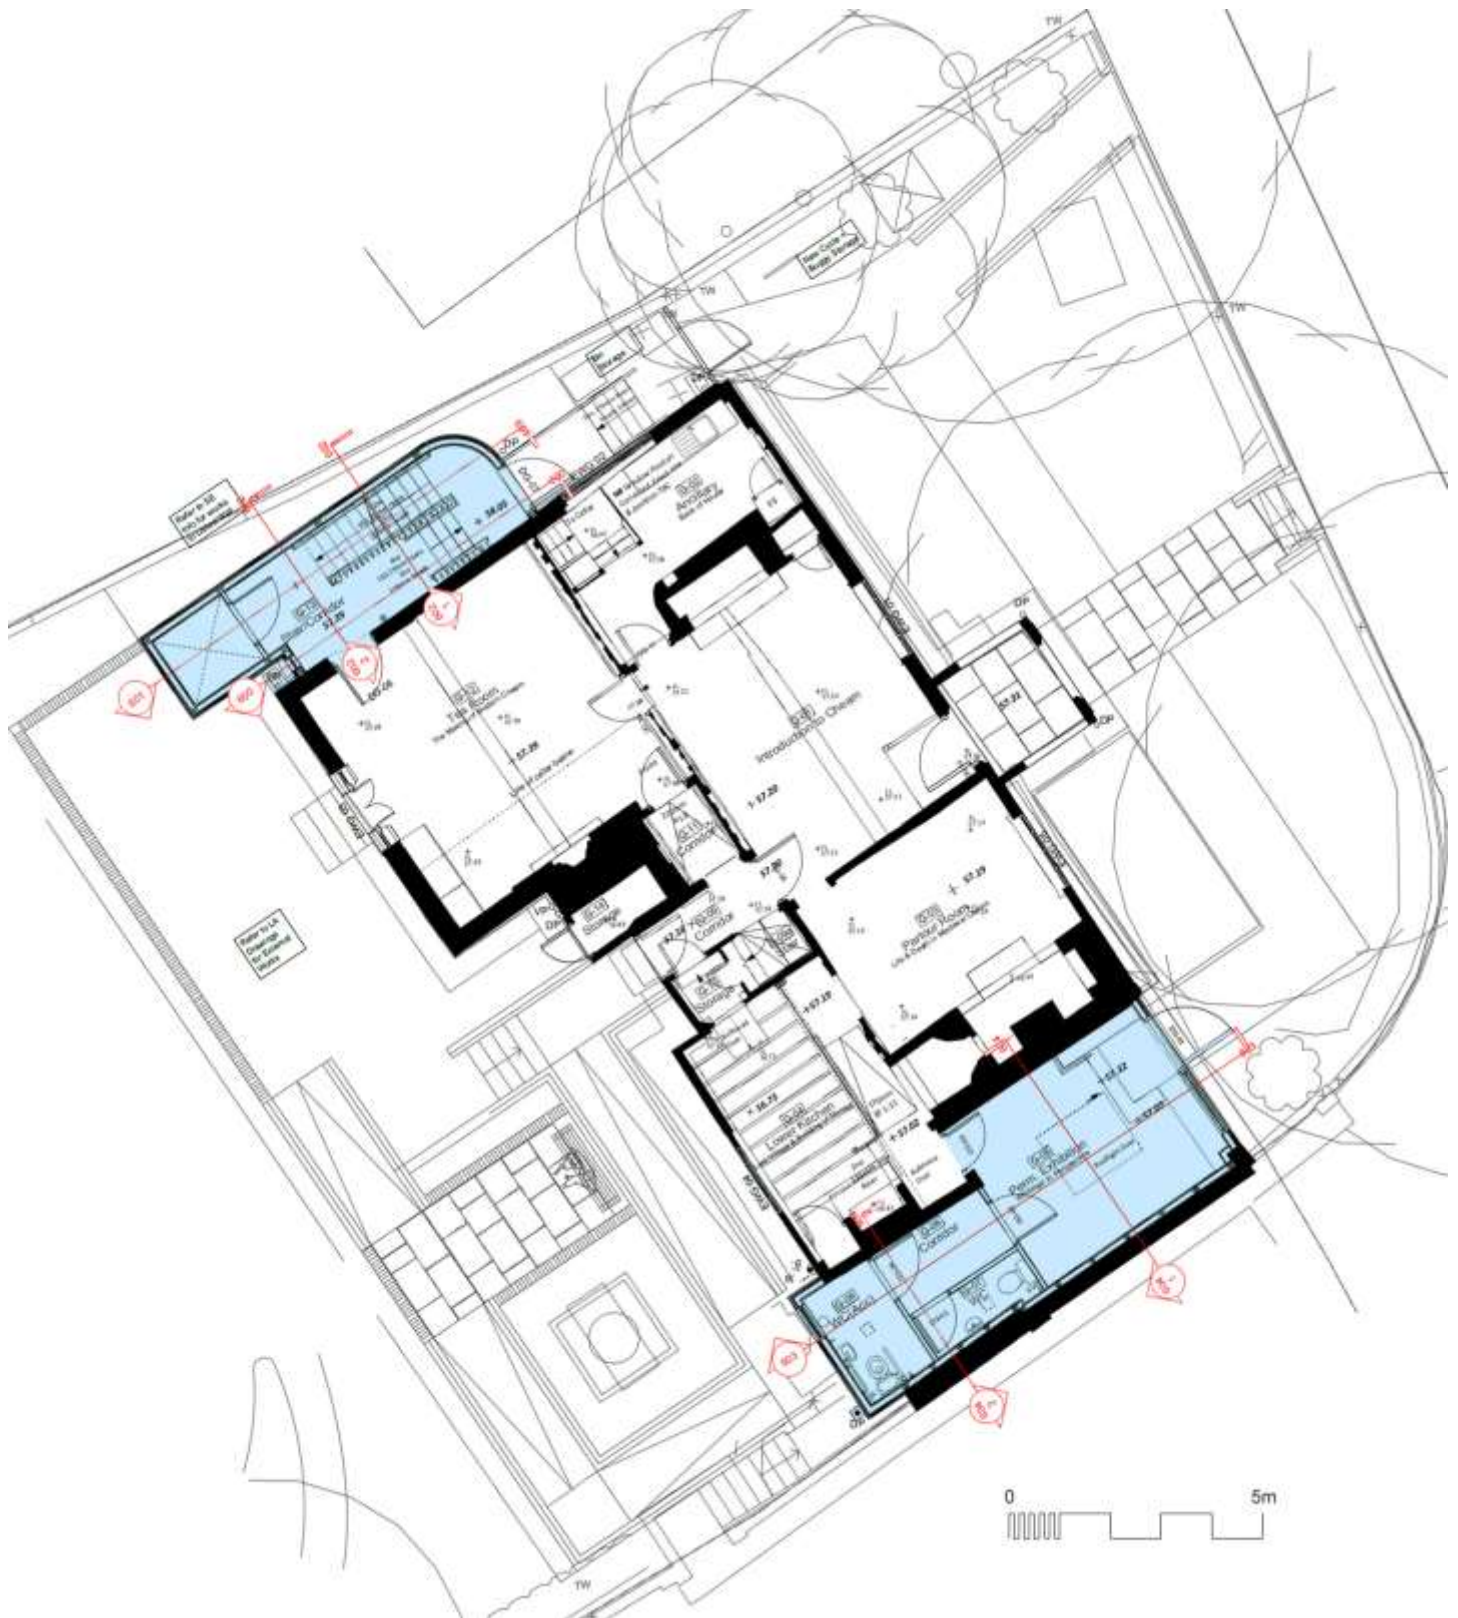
The proposed ground floor development (GA) plan; the principal additions at each end of the building shaded
